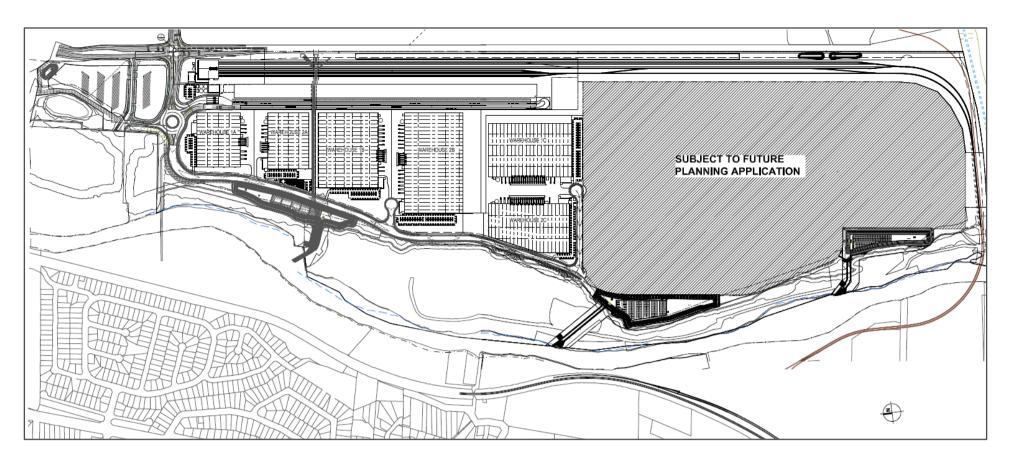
| The Approved Site layout (Source: RTS, Appendix 1, Precinct Plan)
